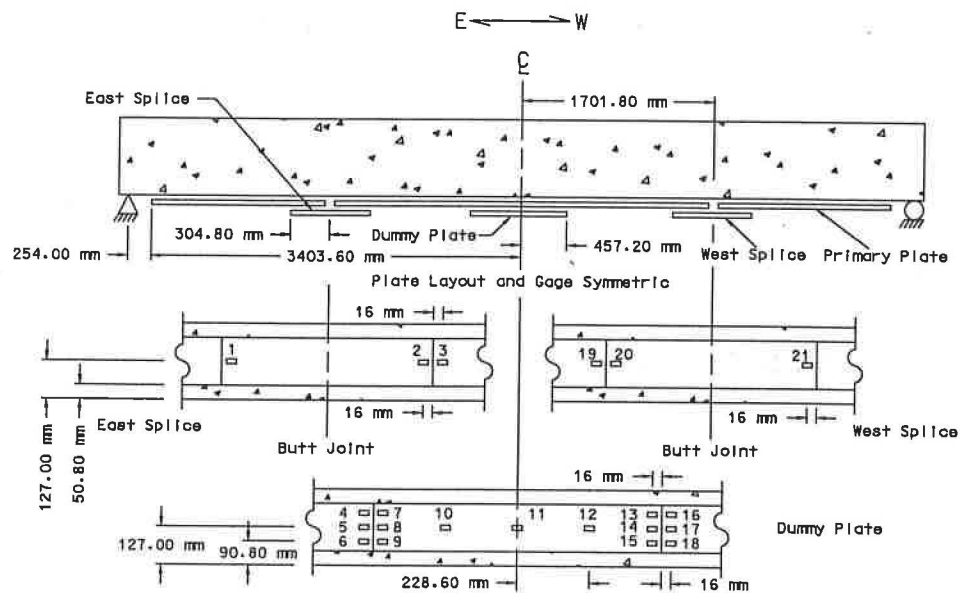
CFRP Plate Layout and Gage Locations, Beam 6 (ULT 1)
